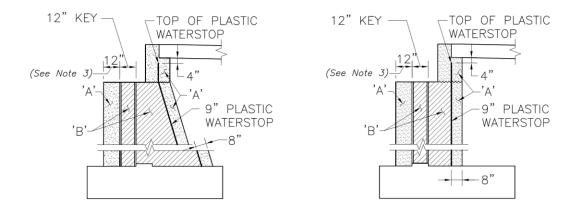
Waterstop through expansion joint in gravity and cantilever abutments (Similarly in wingwalls)
